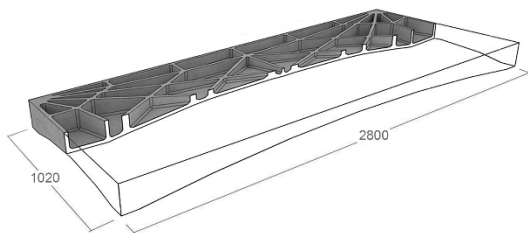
Perspective section of the structural prototype of the “Rib-stiffened funicular floor system”(López López et al., 2014).
